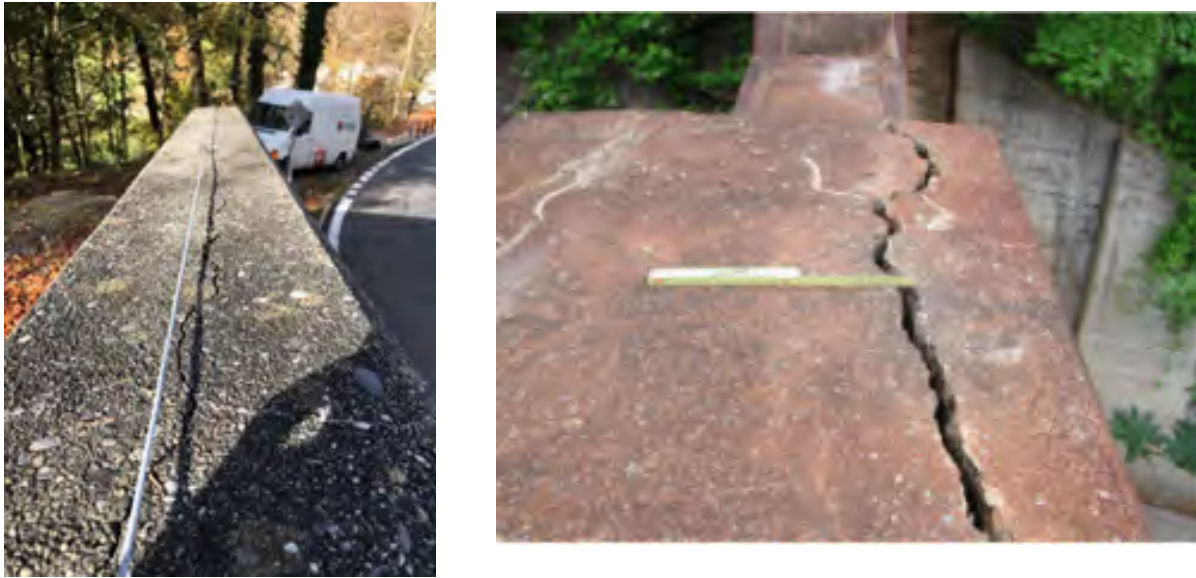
Examples of ASR driven delamination in surface reinforced concrete retaining walls in Switzerland (Courtesy Dr. Leemann, EMPA, Switzerland)
